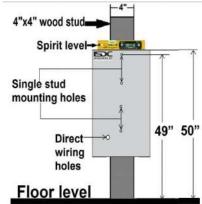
Mark and drill 4 mounting holes using 5/32" wood drill bit
